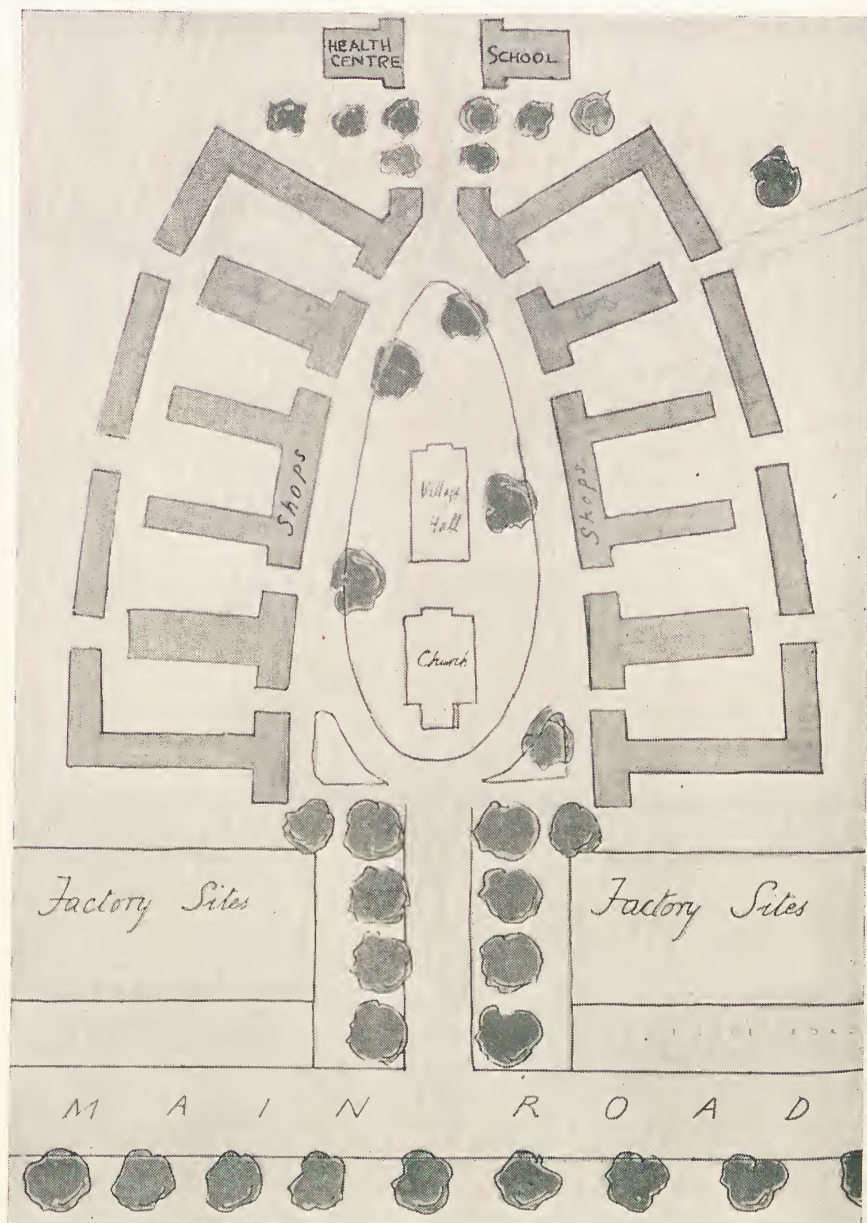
A POSSIBLE GROUP OF ABOUT 200 HOUSES ARRANGED IN COURTS GIVING ACCESS TO A VILLAGE GREEN
